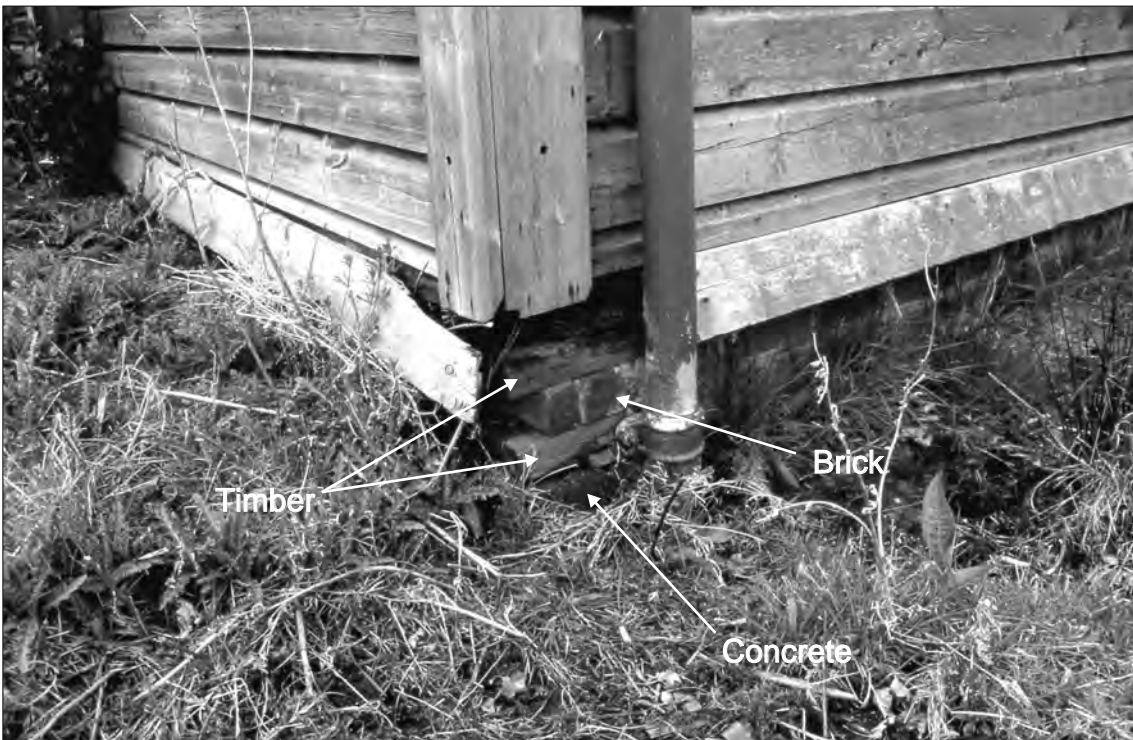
Saighton Camp, Chester: evidence for spider blocks having been raised off the original concrete foundation pillars
